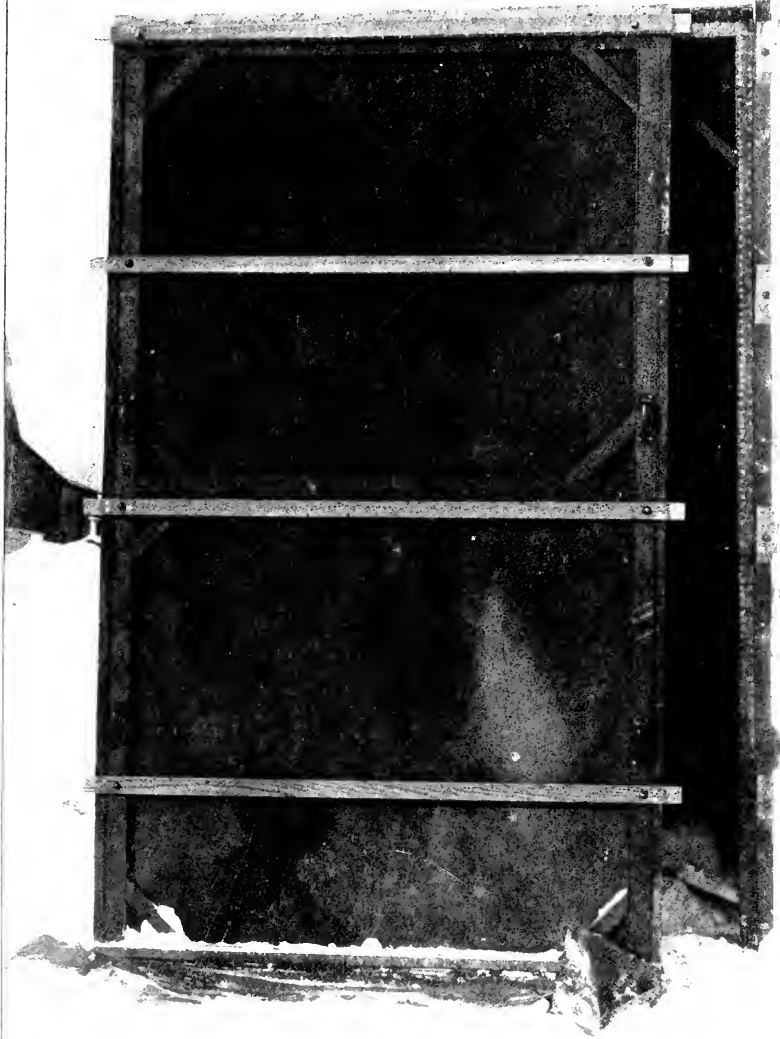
PLATE XIII.—DOOR REMOVED SHOWING PROJECTING ENDS OF STRIPS CUT ON AN ANGLE.
